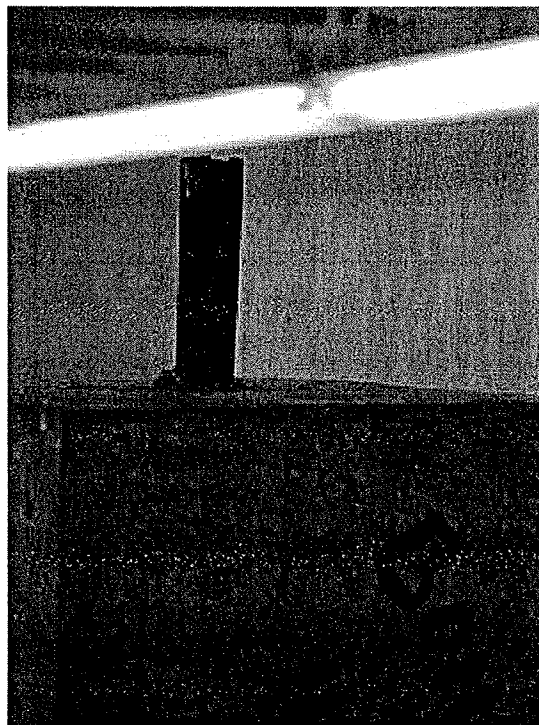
The bond failure of plain basalt rebar reinforced specimen due to slip. The slip can be clearly seen in this photo due to the mark of concrete on rebar.
